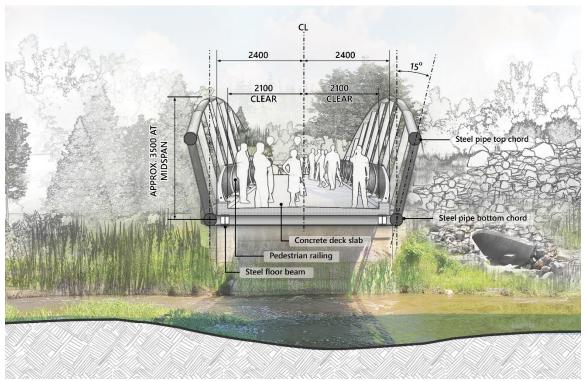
Conceptual Cross-Section View of Proposed Steel Tied-Arch Bridge Design at Smith Crossing (Provided by: Morrison Hershfield, City of Edmonton and EDA Planning + Urban Design 2021)
